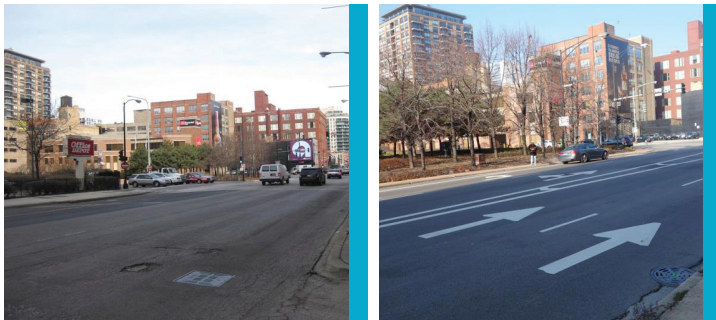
Before (left) and after (right) Conditions of the Pavement Marking Improvements at an Ohio Street (Image: Huaguo Zhou)
